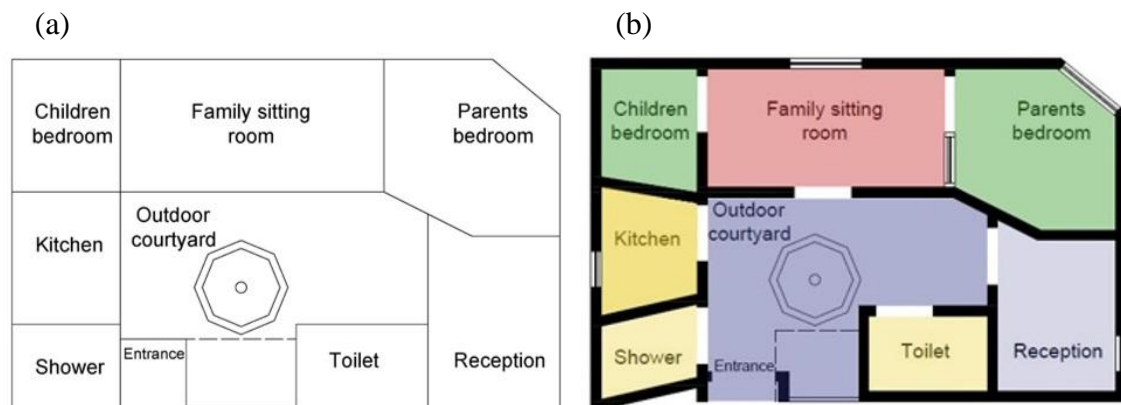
Azraq camp- Group 3: a) Zoning of spaces, b) Plan with openings
